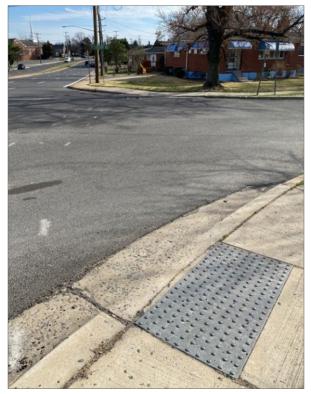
A curb ramp that improperly feeds a crosswalk near Riggs Road in the study area. (PHOTO BY TOOLE DESIGN GROUP)
